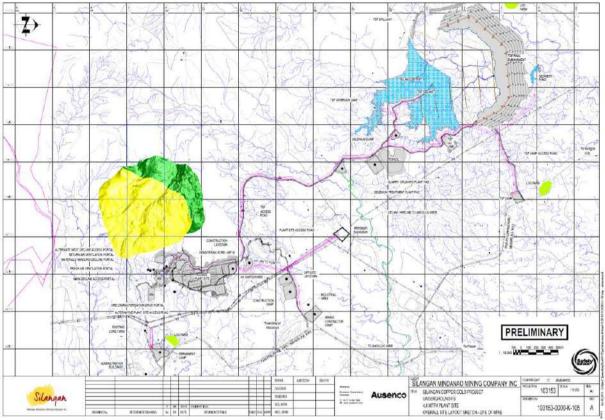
General Layout of the Project Showing Sub Level Caving Mine Facilities
